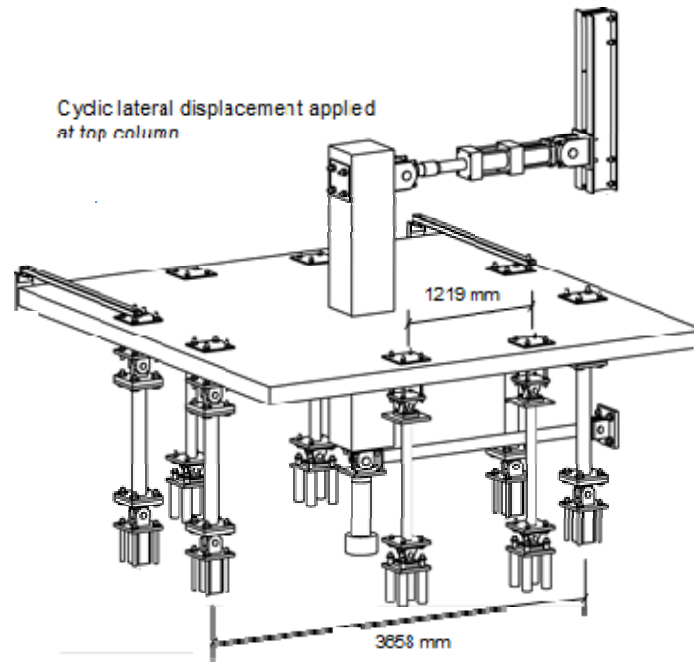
Typical test setup for slab-column connection under cyclic lateral loading (Tian et al. 2008)
